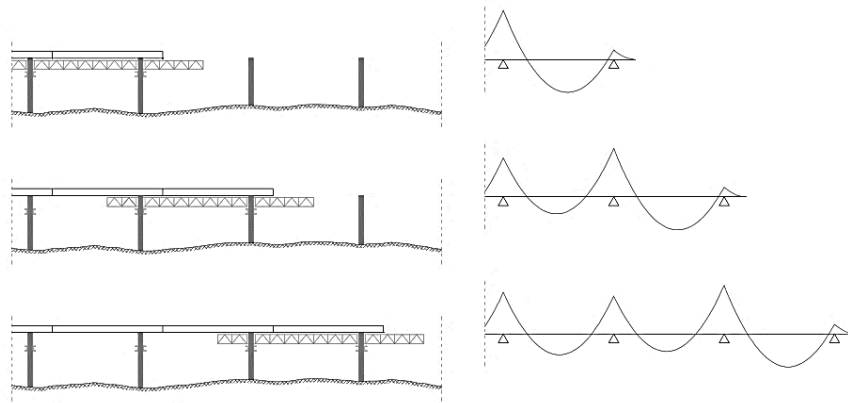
Dead load internal forces resulting from construction with movable scaffolding system (MSS) [12].
